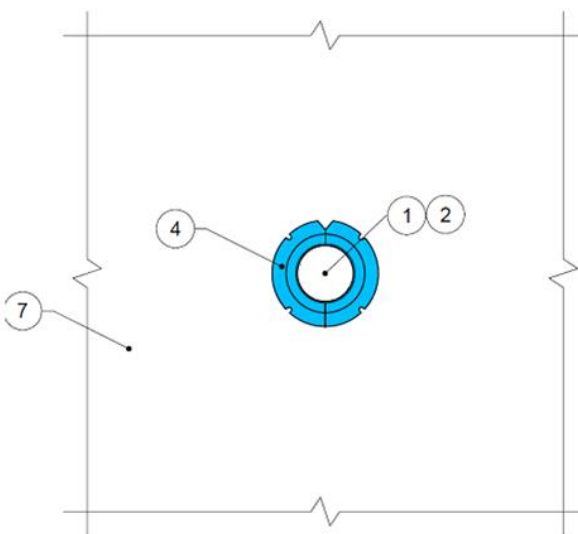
Plastic pipe with PROMASEAL® FCS 40 – 100 collars (floor underside plan view)
